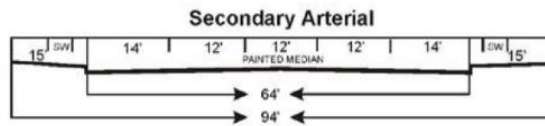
CITY OF PERRIS GENERAL PLAN ROADWAY CROSS-SECTIONS
